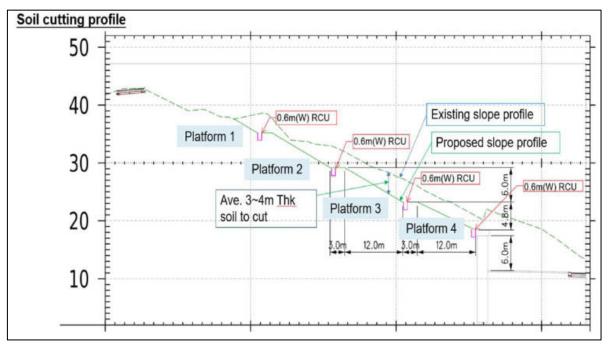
Detailed elevation view of cut slope profiles on all 4 platforms
